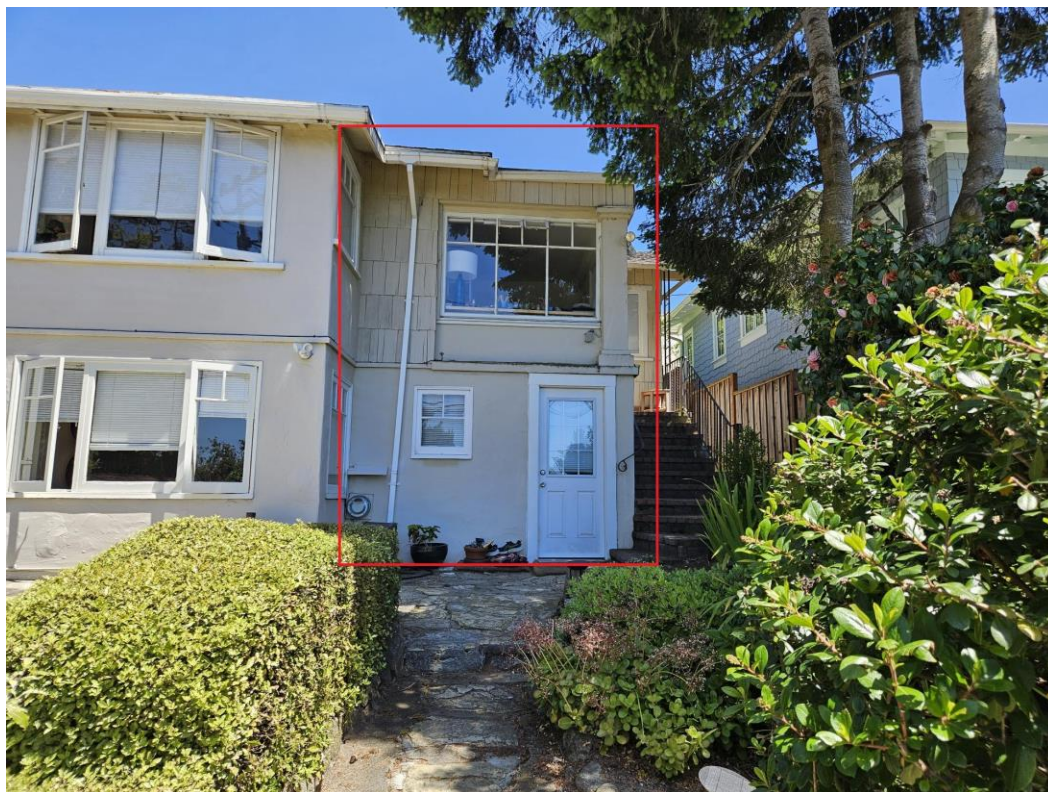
View of infilled porch (upper floor) and added subordinate unit (lower floor).
